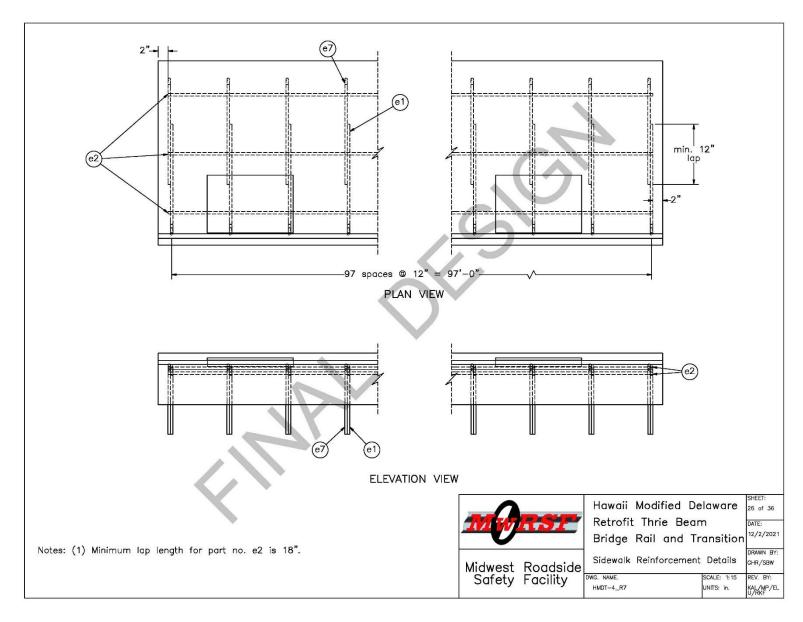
Sidewalk Reinforcement Details, Test No. HMDT-4
